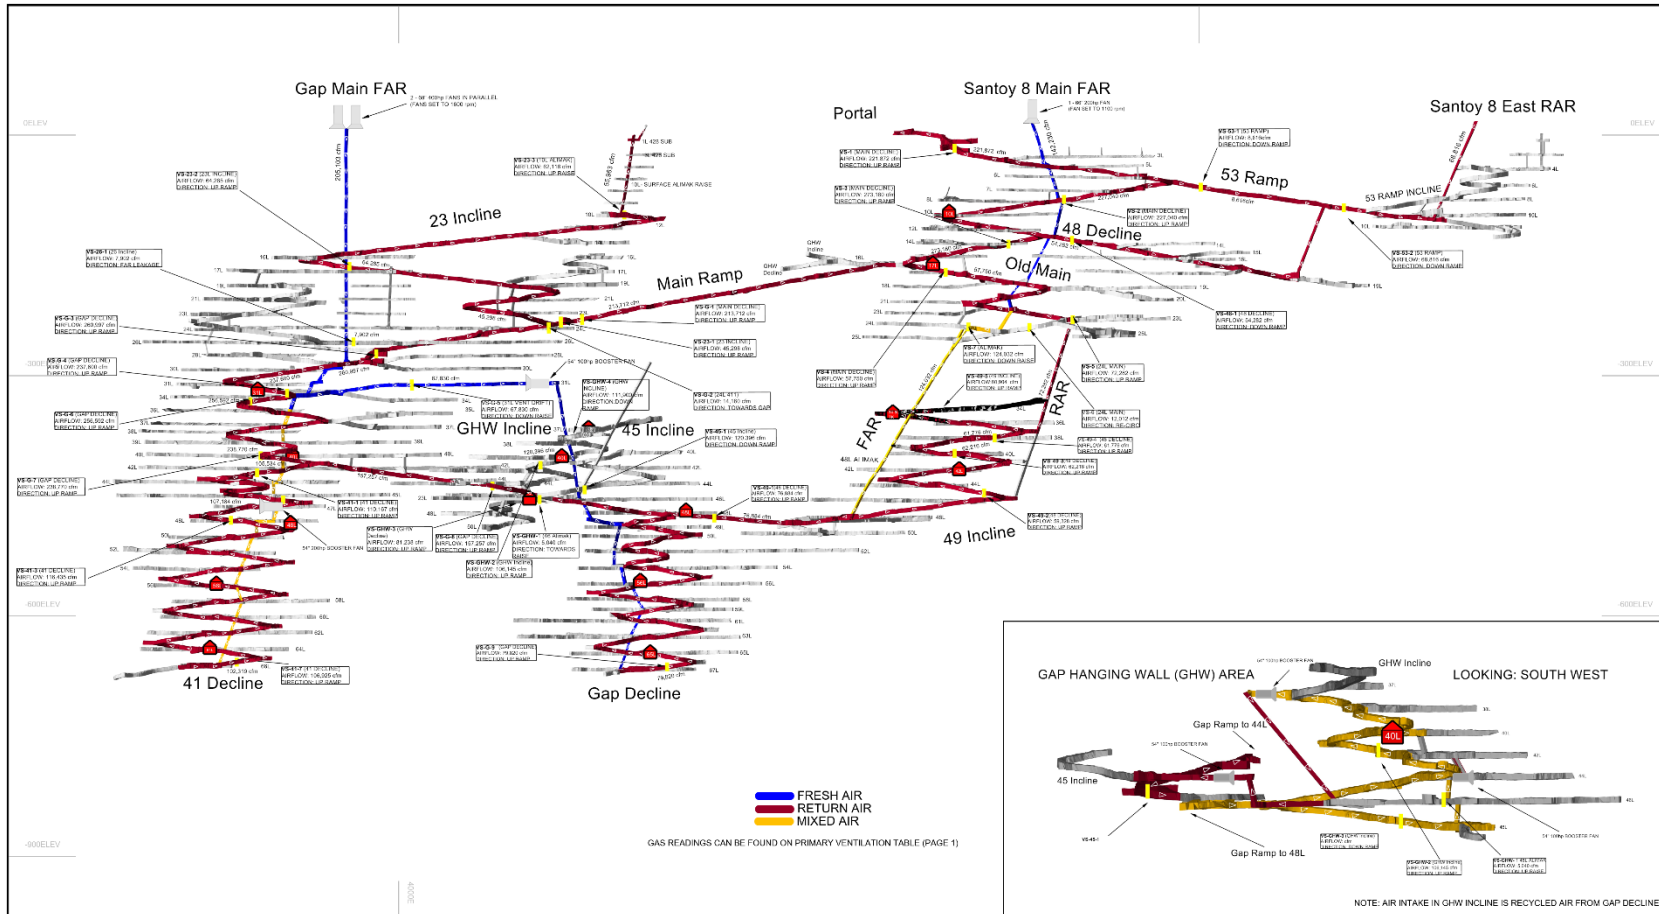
Santoy Mine Ventilation Long-Section Looking Northwest
